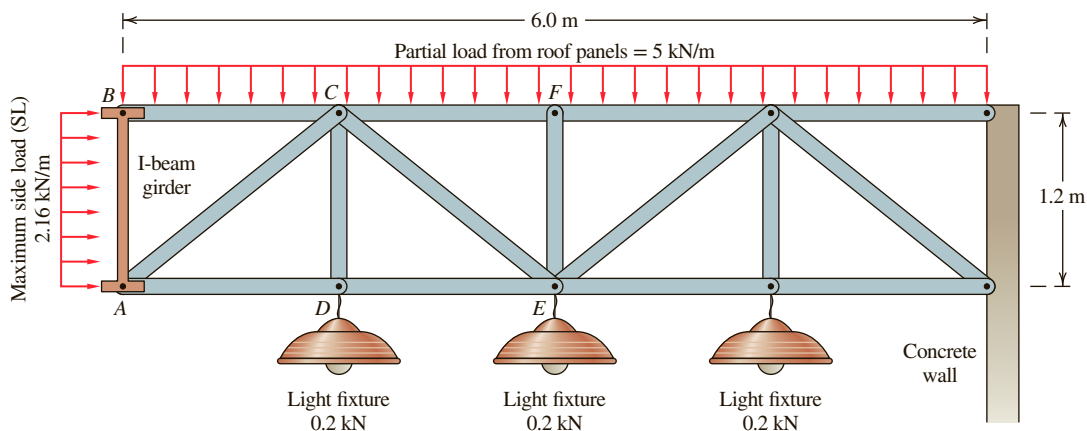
Model of one truss supporting I-beam steel girder.
